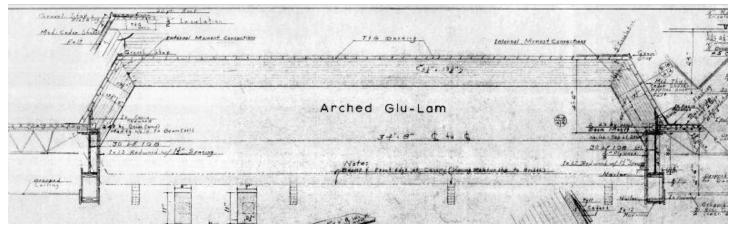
Profile of Glu-Lam beams, looking north (original plans)
